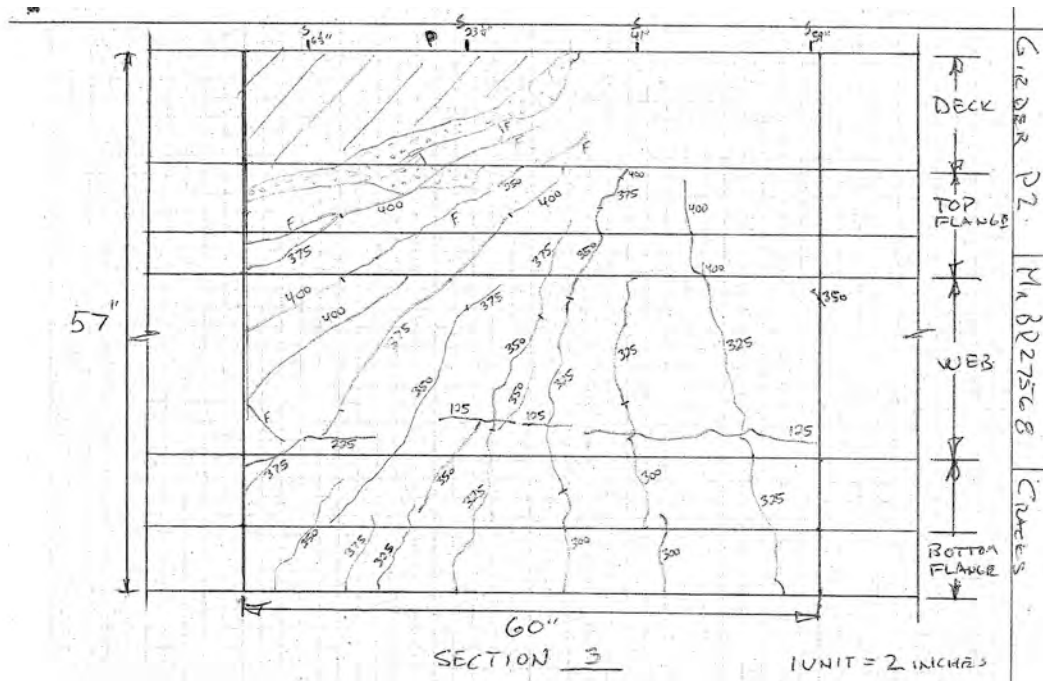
Girder P2 crack pattern – Section 3 (first flexural crack on South side at 300k)
